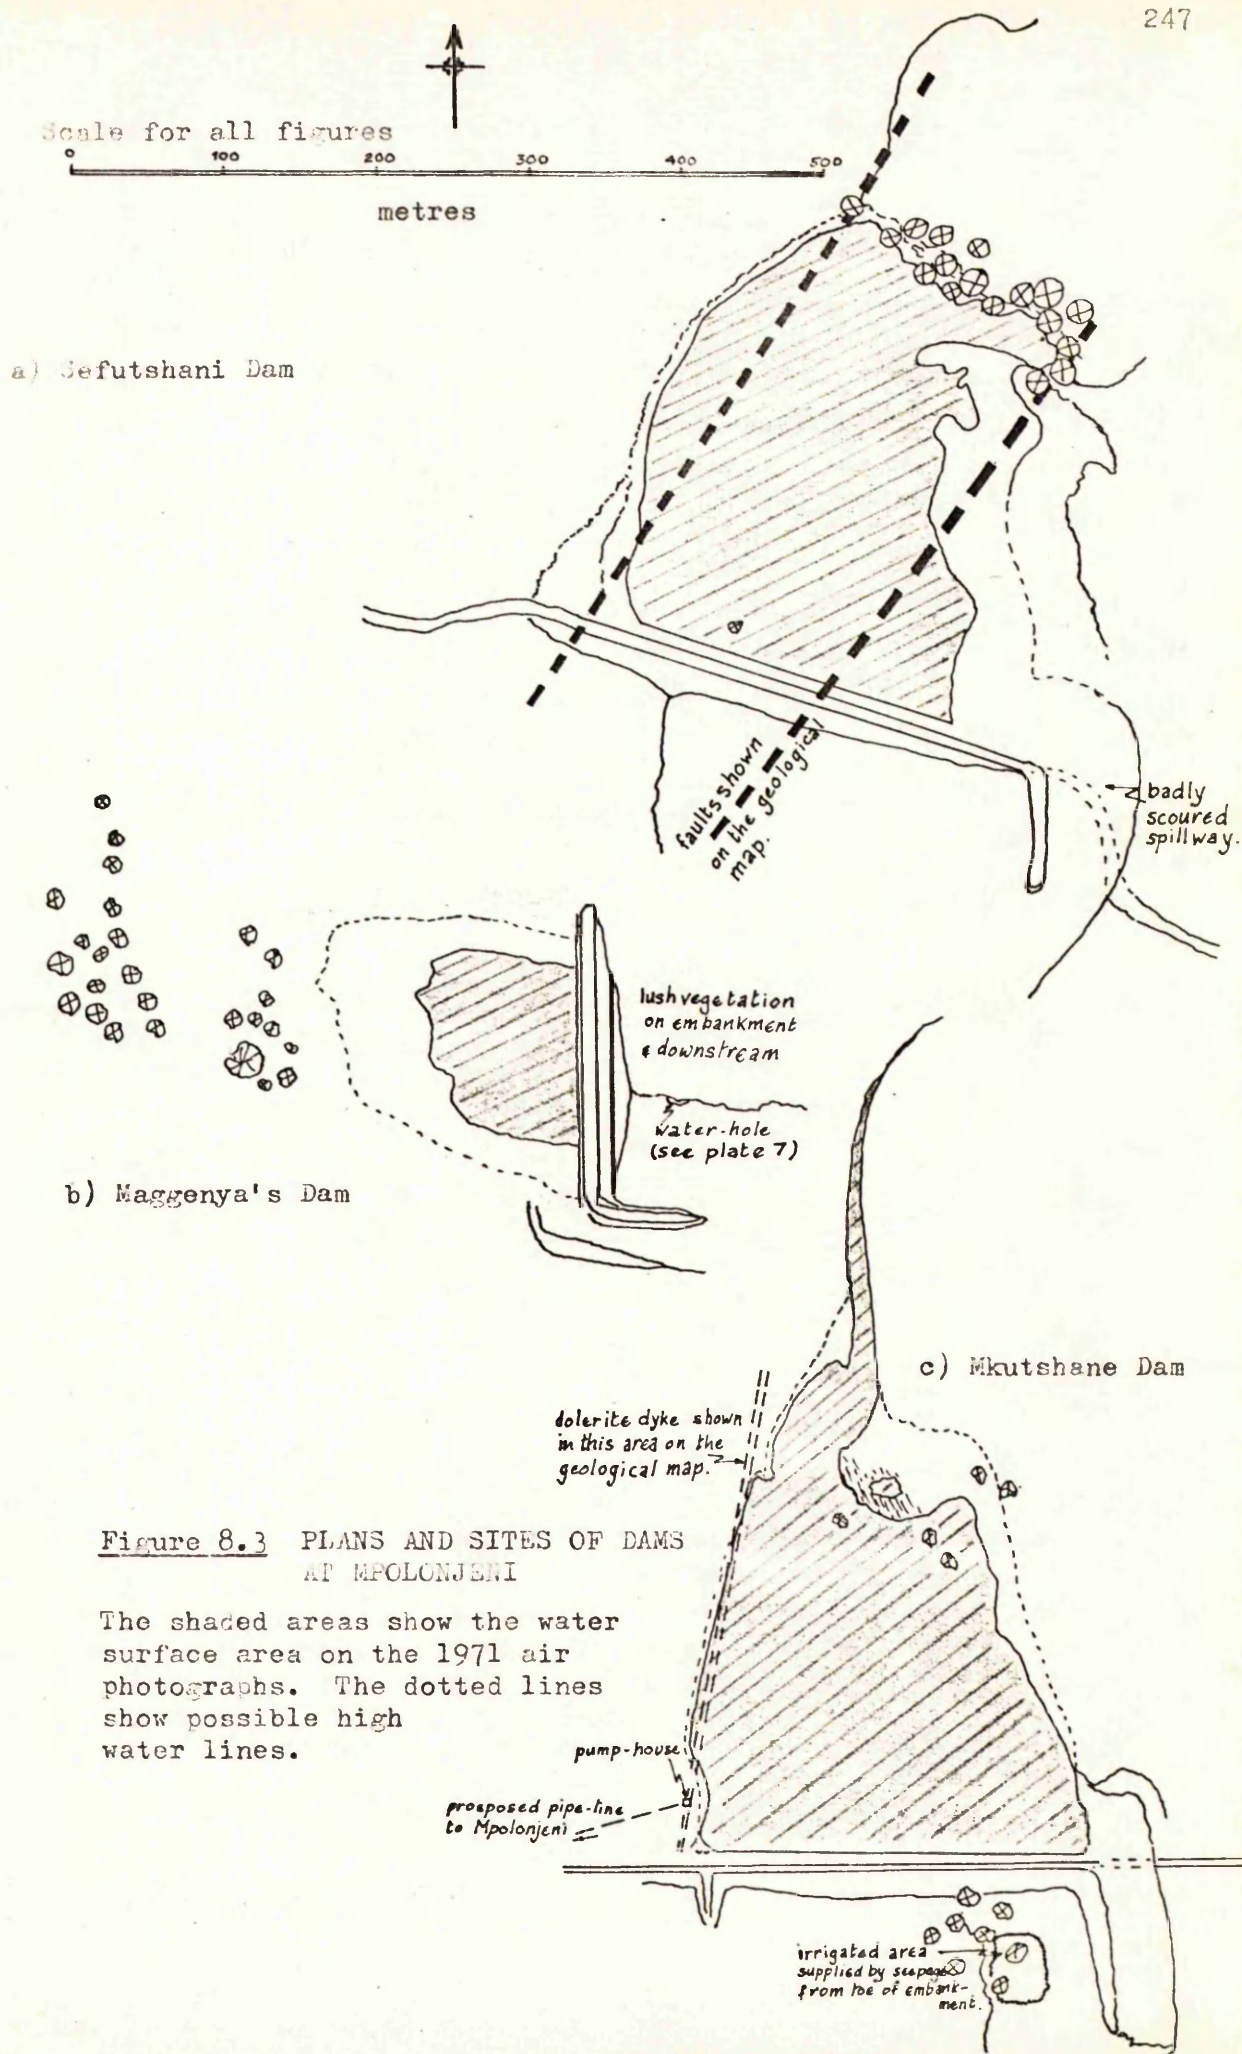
PLANS AND SITES OF DAMS AT MPOLONJENI
